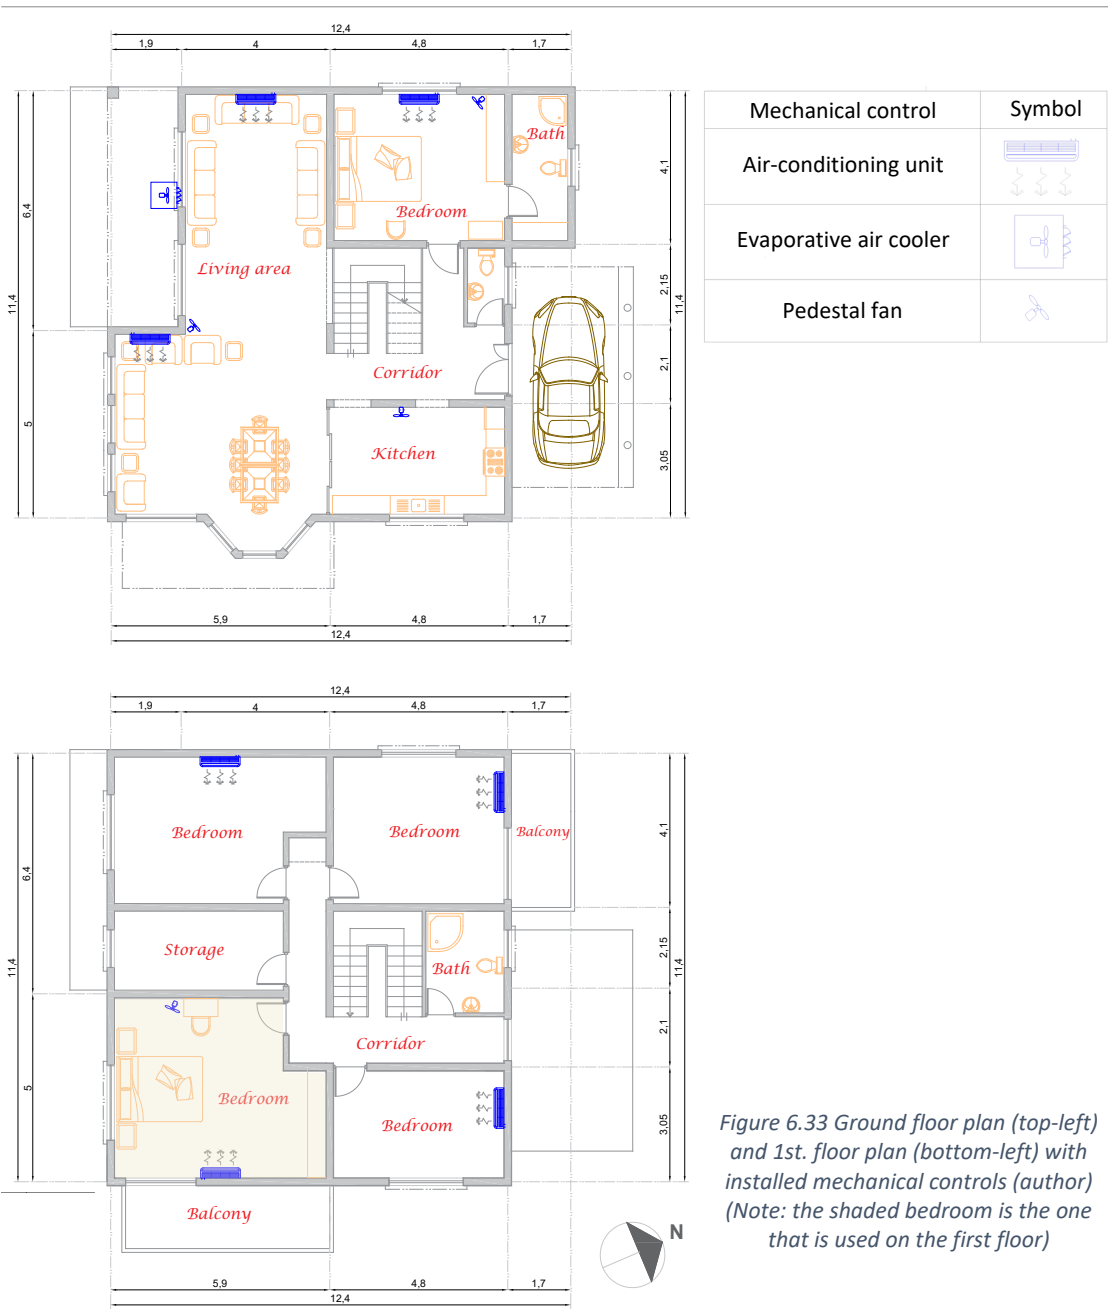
Ground floor plan (top-left) and 1st. floor plan (bottom-left) with installed mechanical controls (author) (Note: the shaded bedroom is the one that is used on the first floor)
